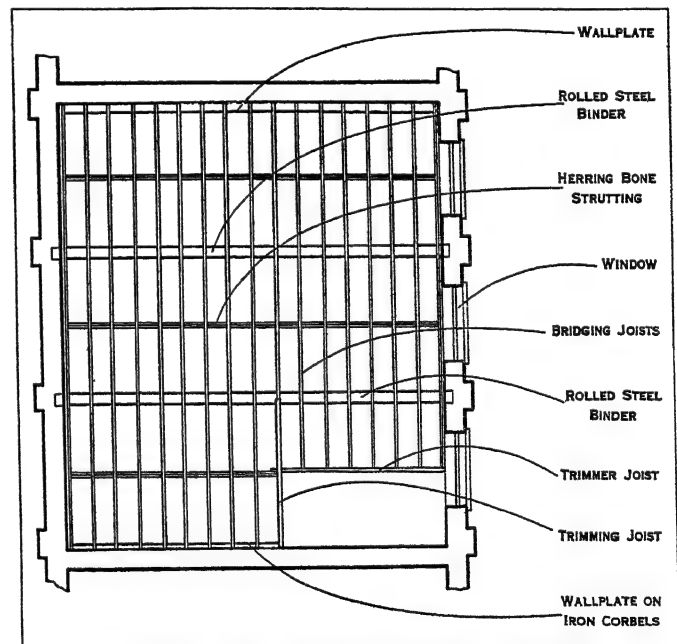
DOUBLE FLOOR WITH STEEL BINDERS. THE JOISTS, OF FIR, ARE TRIMMED INTO STEEL GIRDERS
